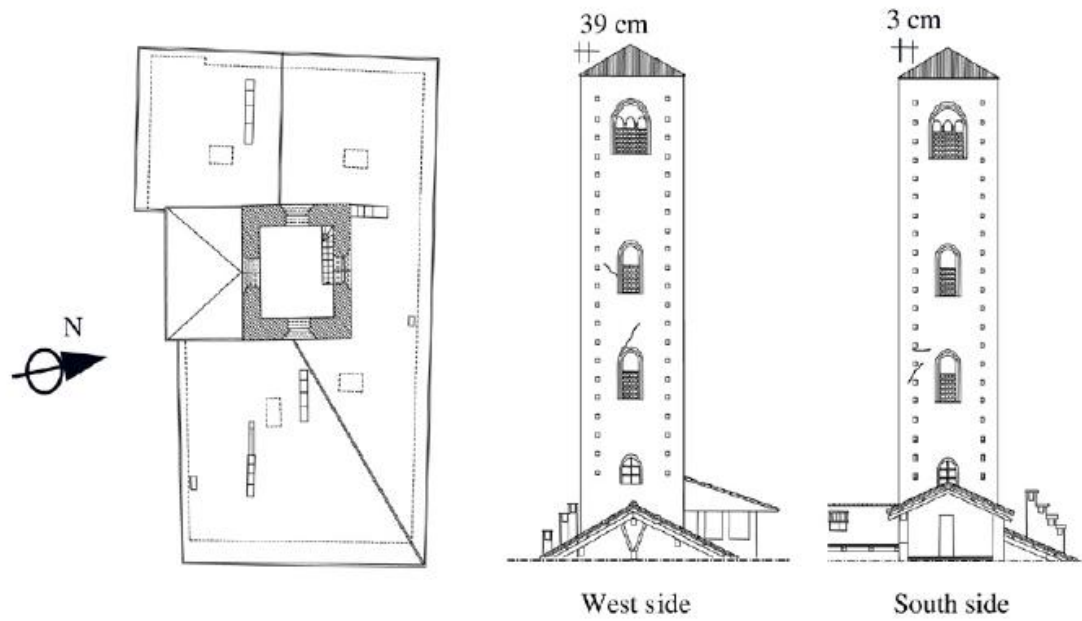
Torre Sineo. Plan and elevations of two sides of the tower. Notice the presence of cracks near the openings and the deviation from verticality of the tower.
